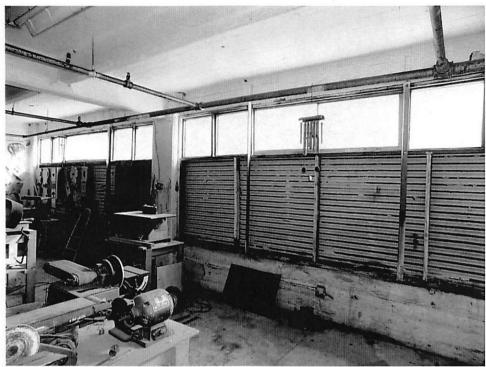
Interior, third floor Unit J, typical window detail showing ca. 1978 wood frame inset into original concrete opening.
